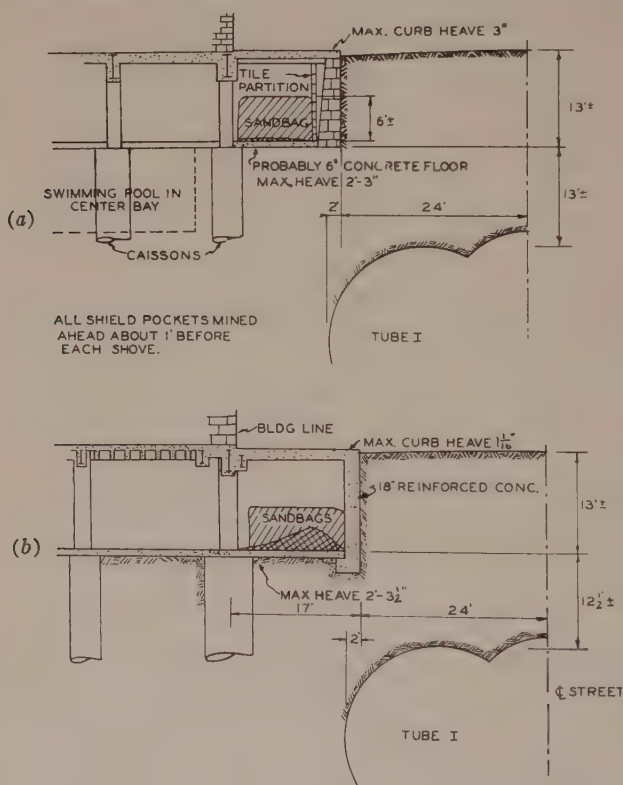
OBSERVED HEAVE OF CONCRETE FLOOR IN VAULTS
